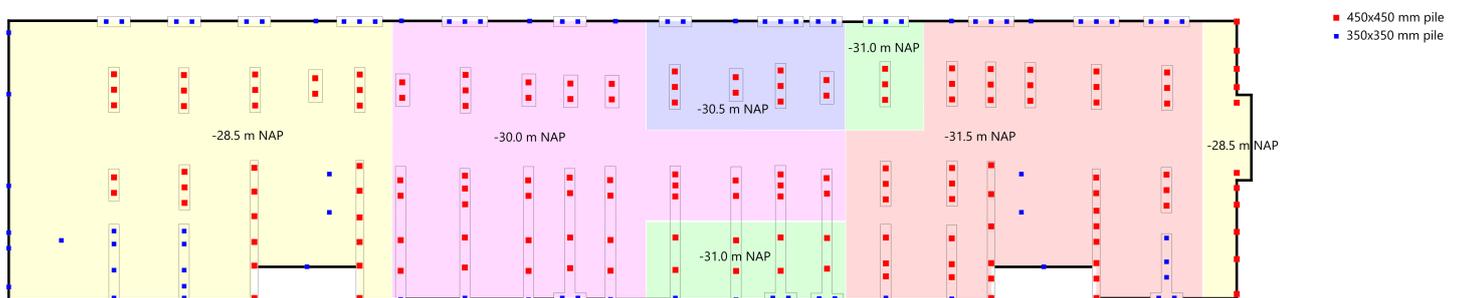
Pile Plan - KasseNova aan de Vaart - Design Variant 1
